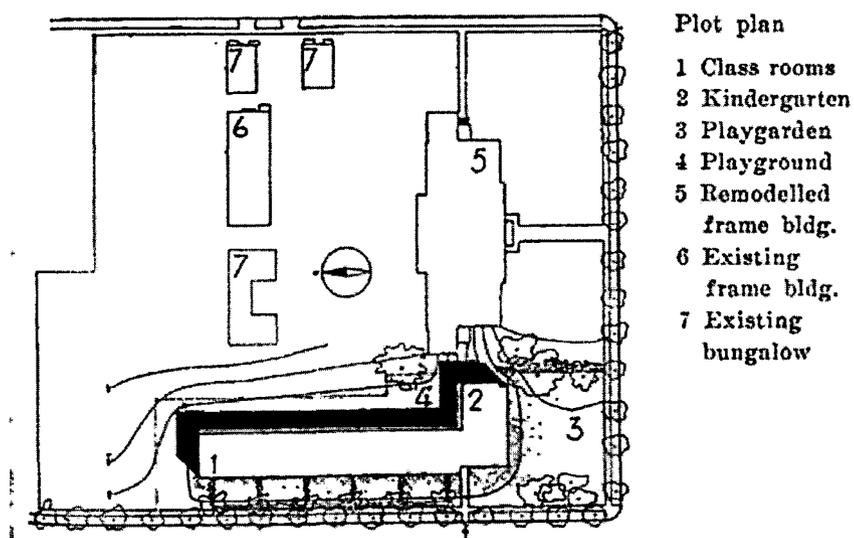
Site plan, Corona Avenue School addition, with the existing building shown (Boesiger 151).
